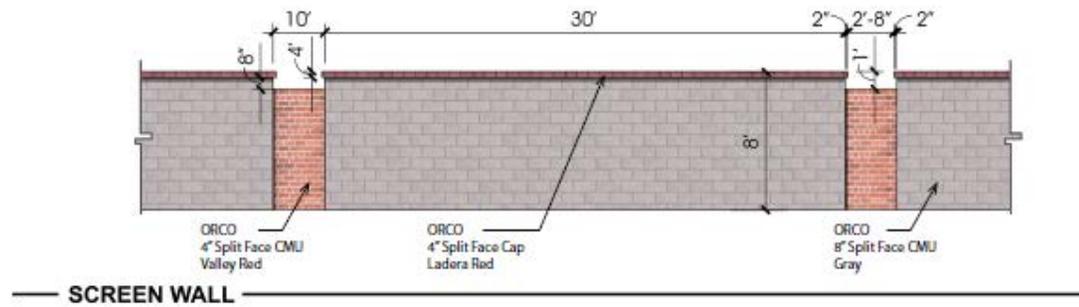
FENCE AND WALL PLAN WITHOUT BESS
